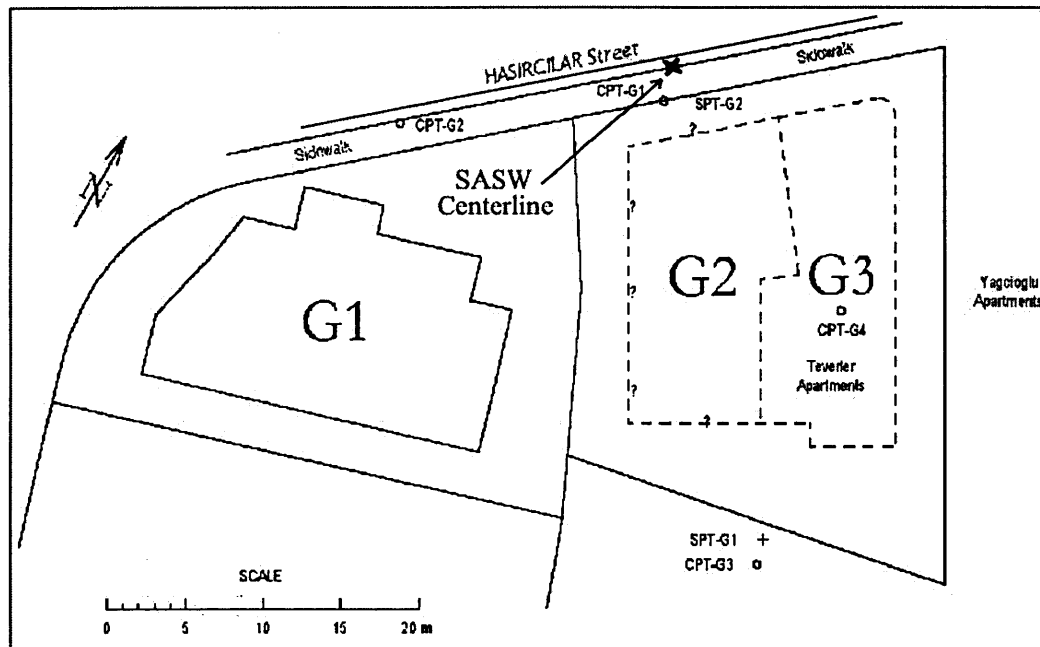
Plan view of Site G showing the location of one SASW centerline (modified from <http://peer.berkeley.edu/turkey/adapazari>).
